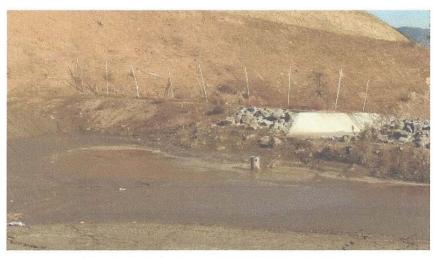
Trash Gard on outlet of Cell CC3 earthen basin
